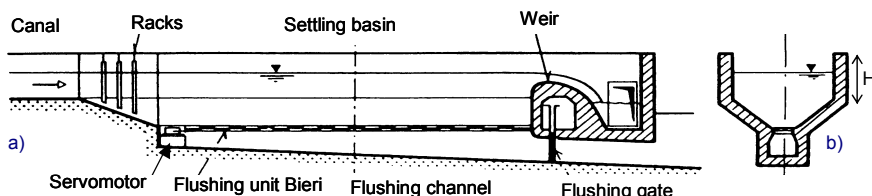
Layout of Bieri sediment trap: a) Longitudinal section; b) cross section [1]
